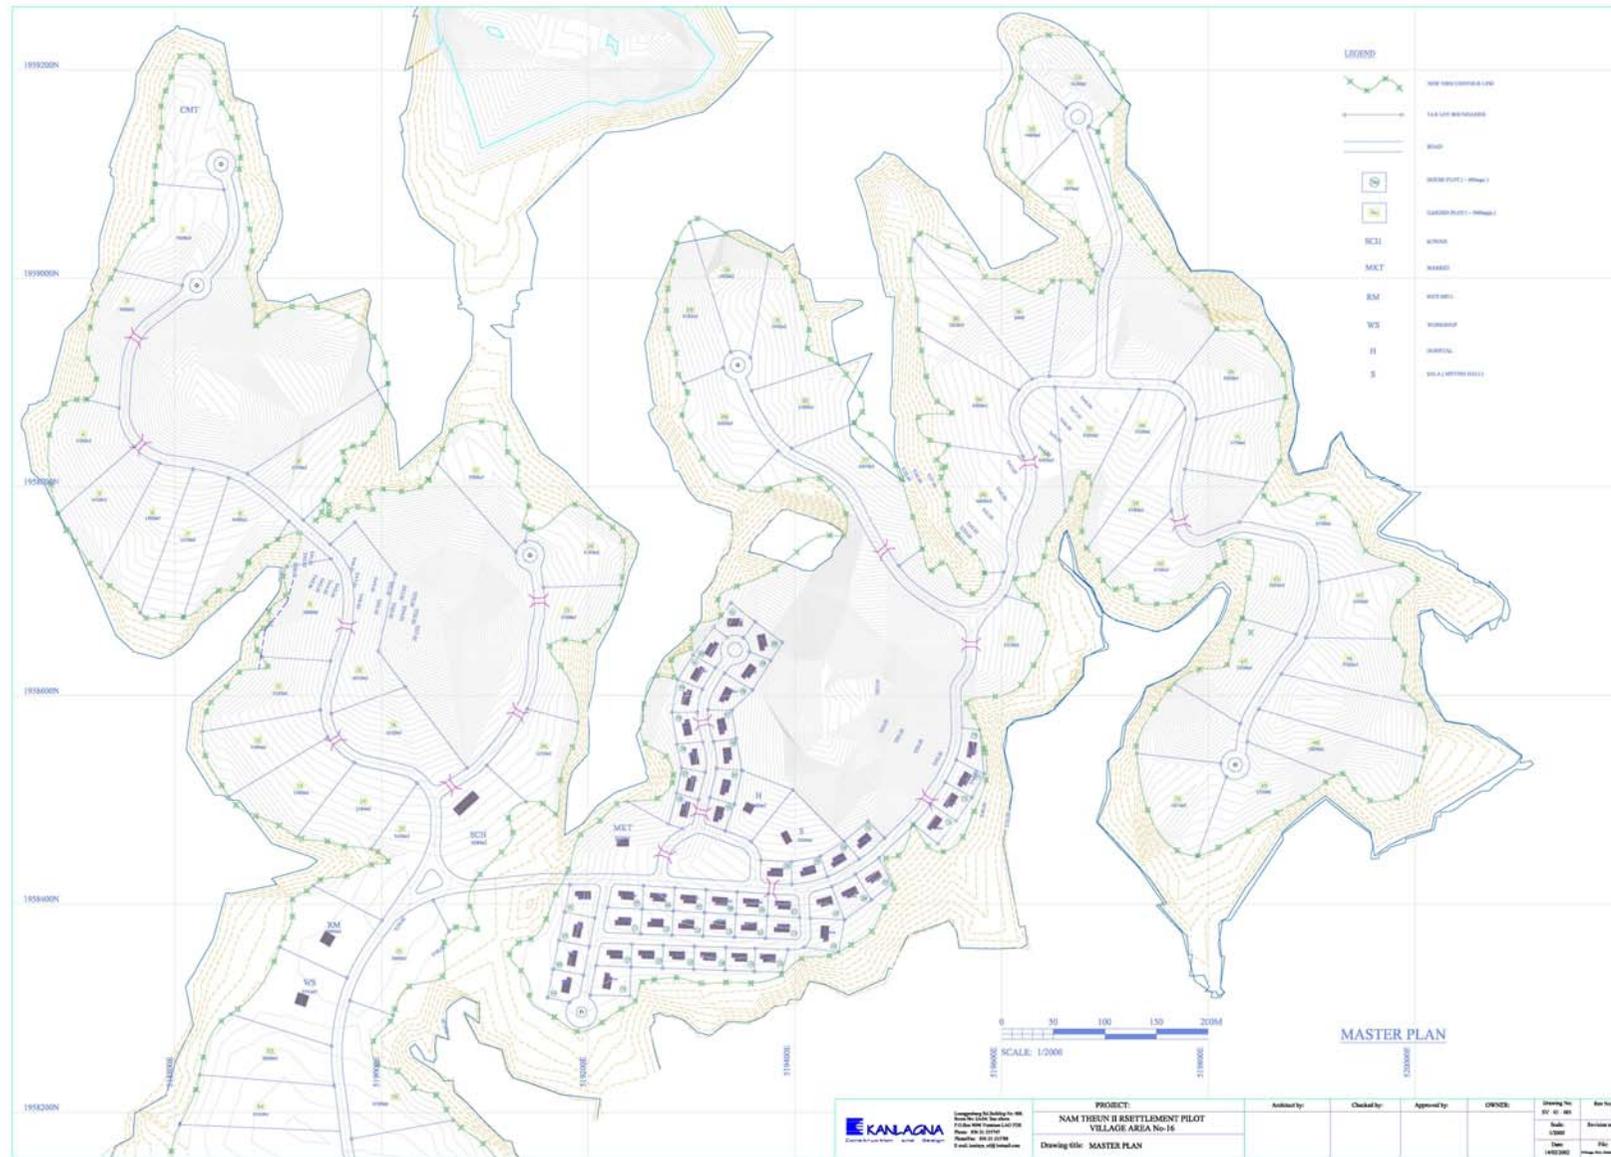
Proposed Pilot Village Layout 2 - Houses Grouped in a Village - Chosen by Villagers
